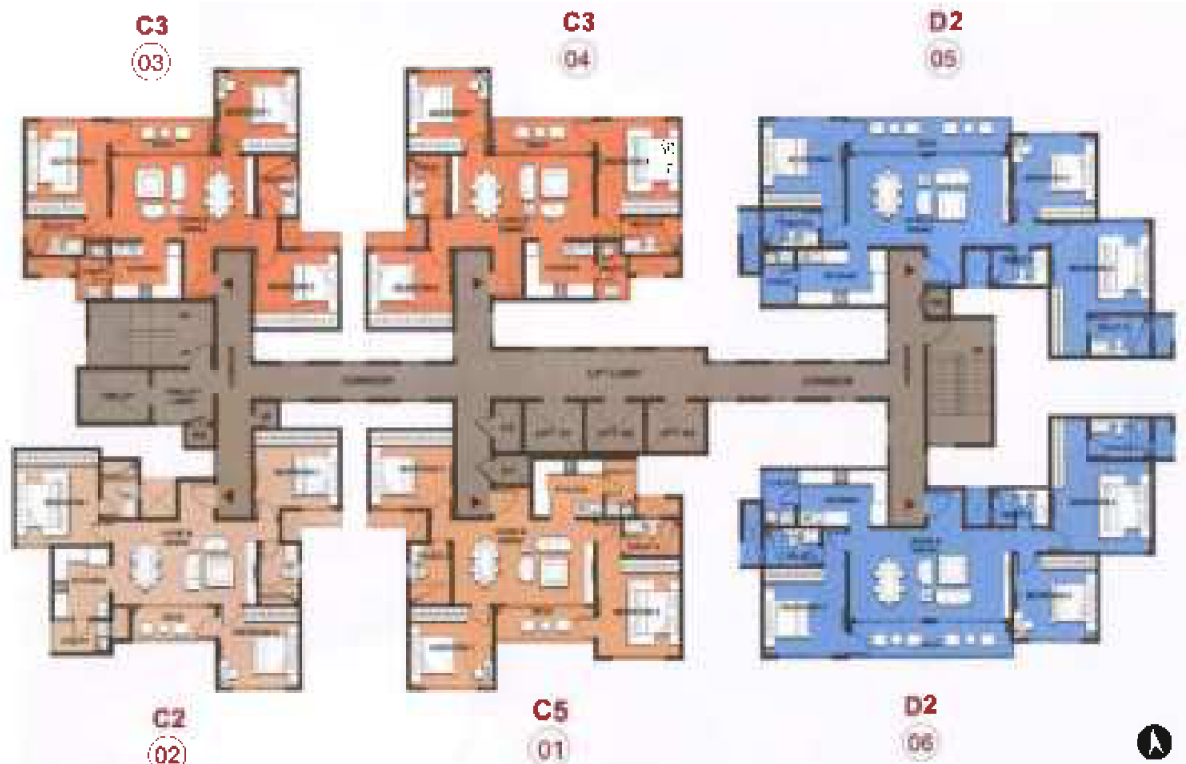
Brochure p. 52, Tower 18 typical floor: C5 at 01; C2 at 02; C3 at 03/04; D2 at 05/06. This floor-plan family offers six homes per regular floor.
